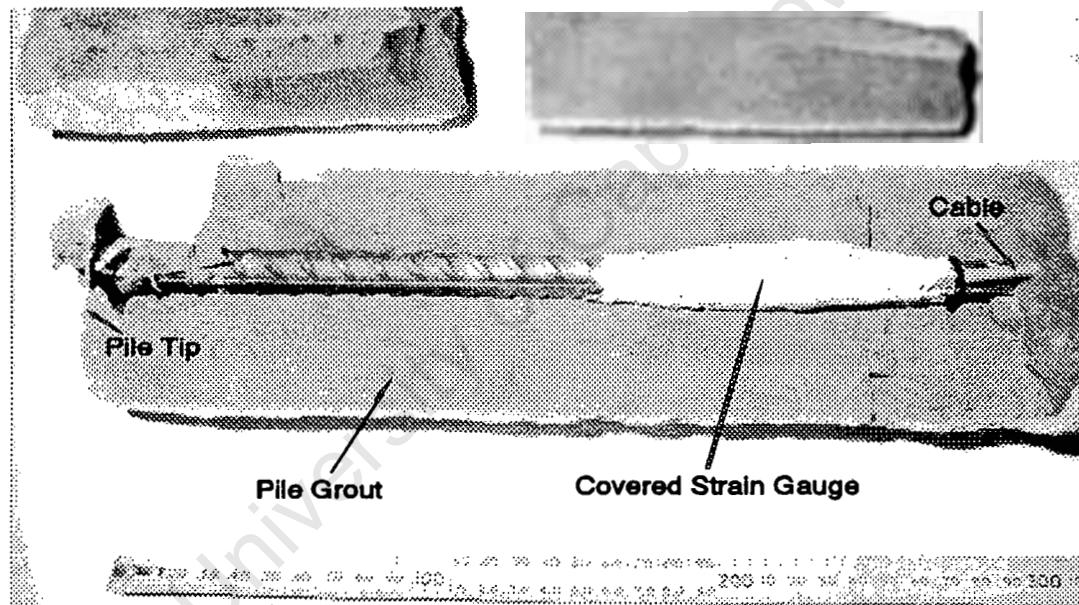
Scanned image of photograph of in-situ gauge assembly (with covering) within a grouted pile
